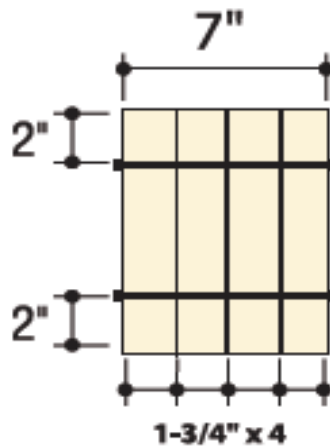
ASSEMBLY C (4-PLY BEAM)
